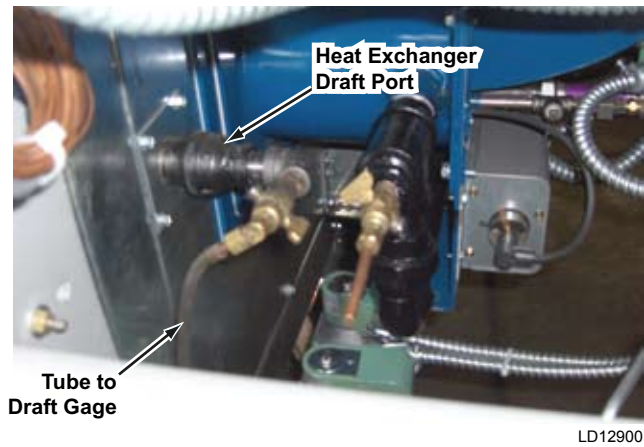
DRAFT OVER FIRE TEST PORT
